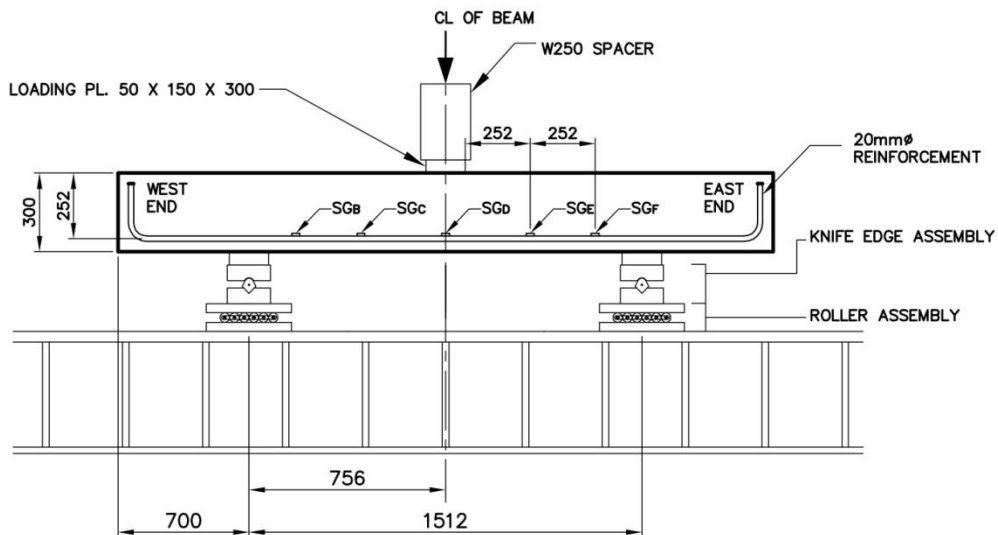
Specimen S300-A2 Test Setup and Configuration
